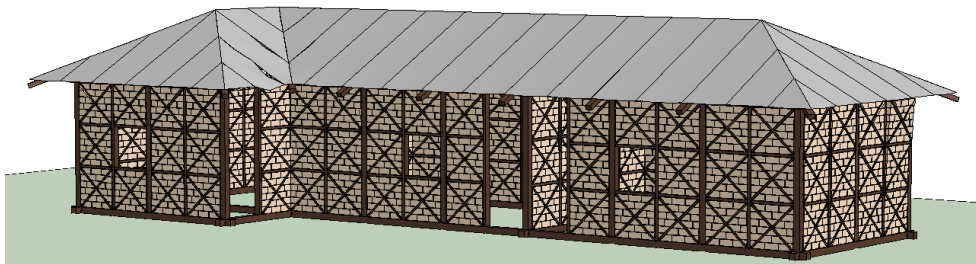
Condition of building after PEER 1161 analysis (without nailed connections)
